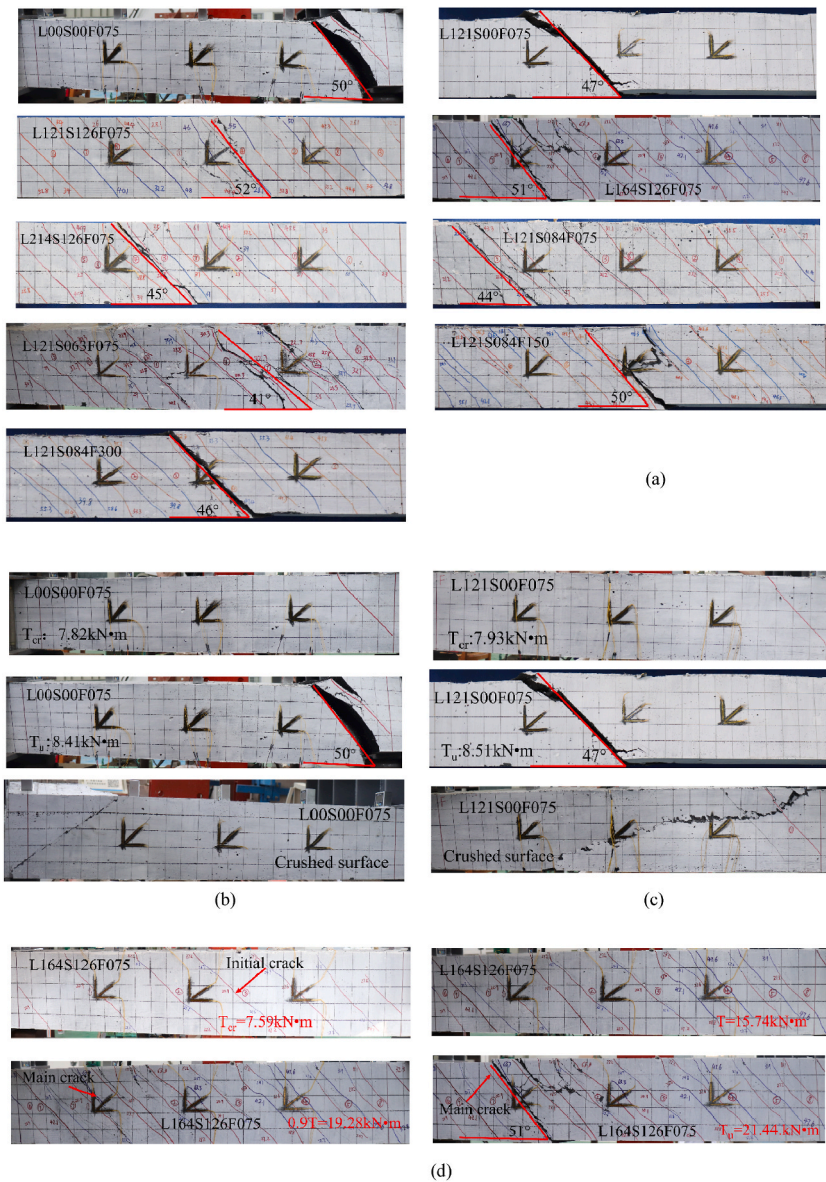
Failure modes; (a) Test beam failure figure, (b) L00S00F075, (c) L121S00F075, (d) L164S126F075.
